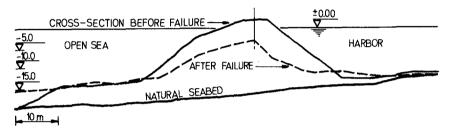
Typical cross-section with outlines before and after the failure
